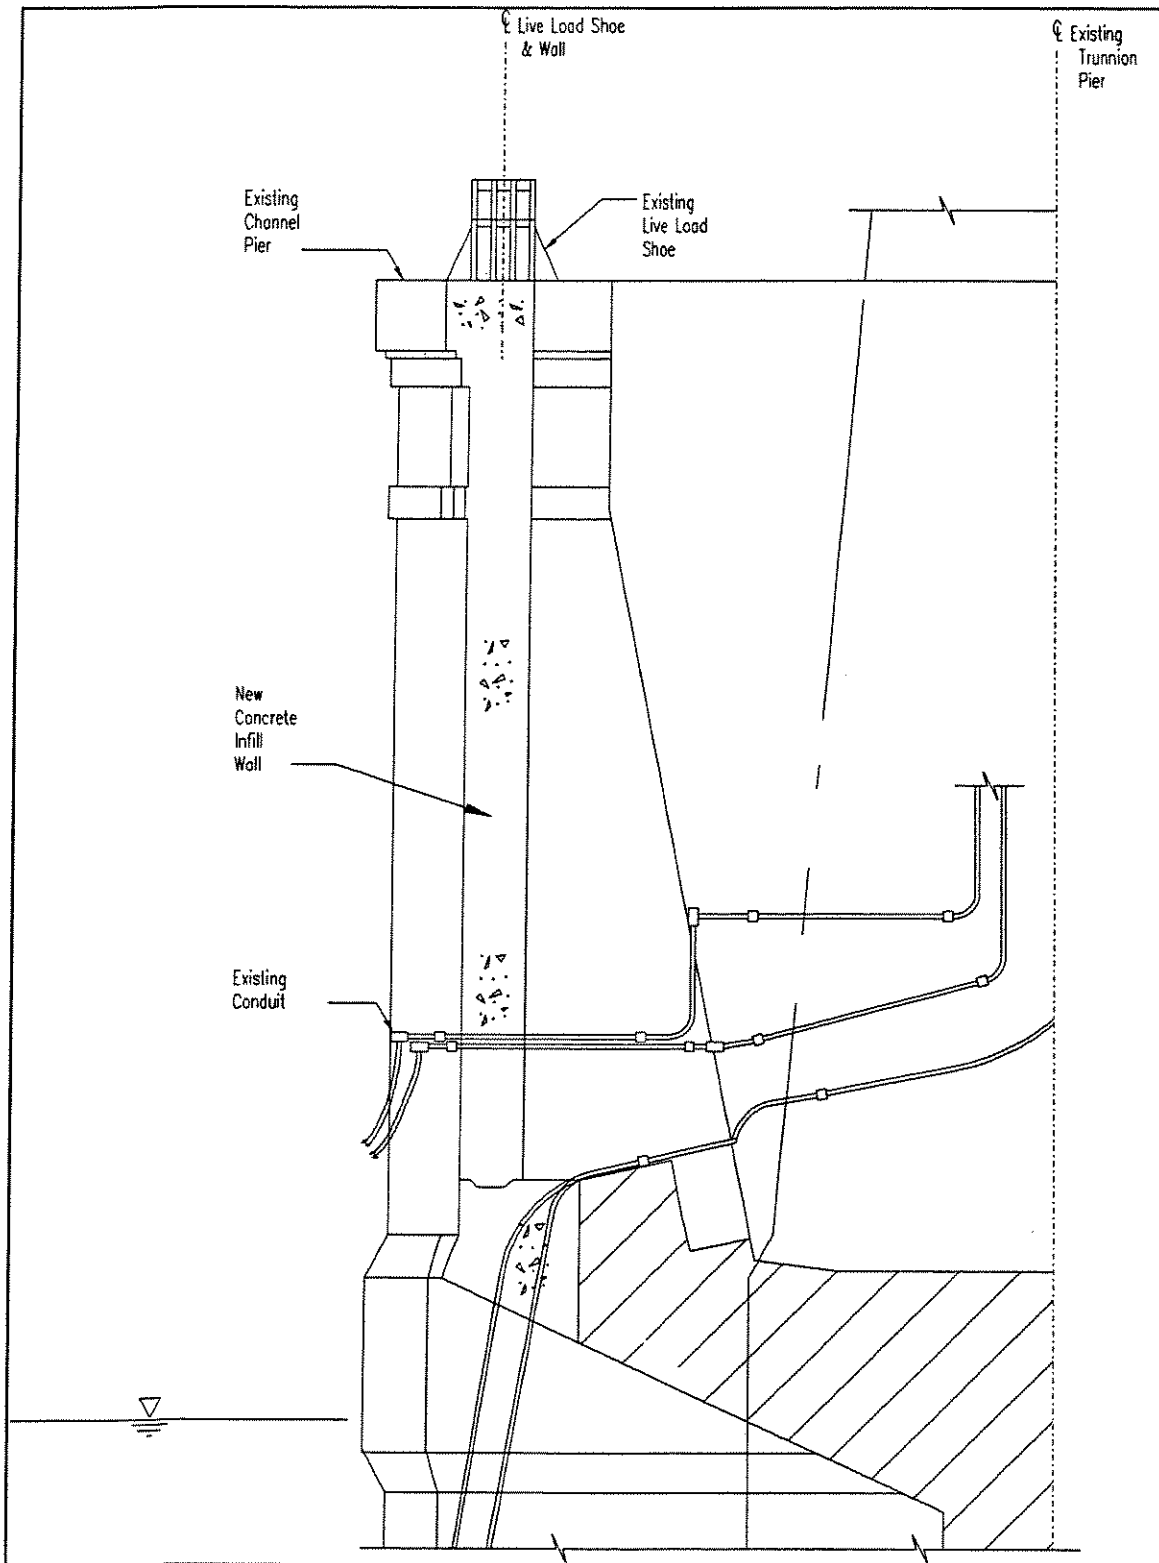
Infill Wall Retrofit between Channel Piers.
